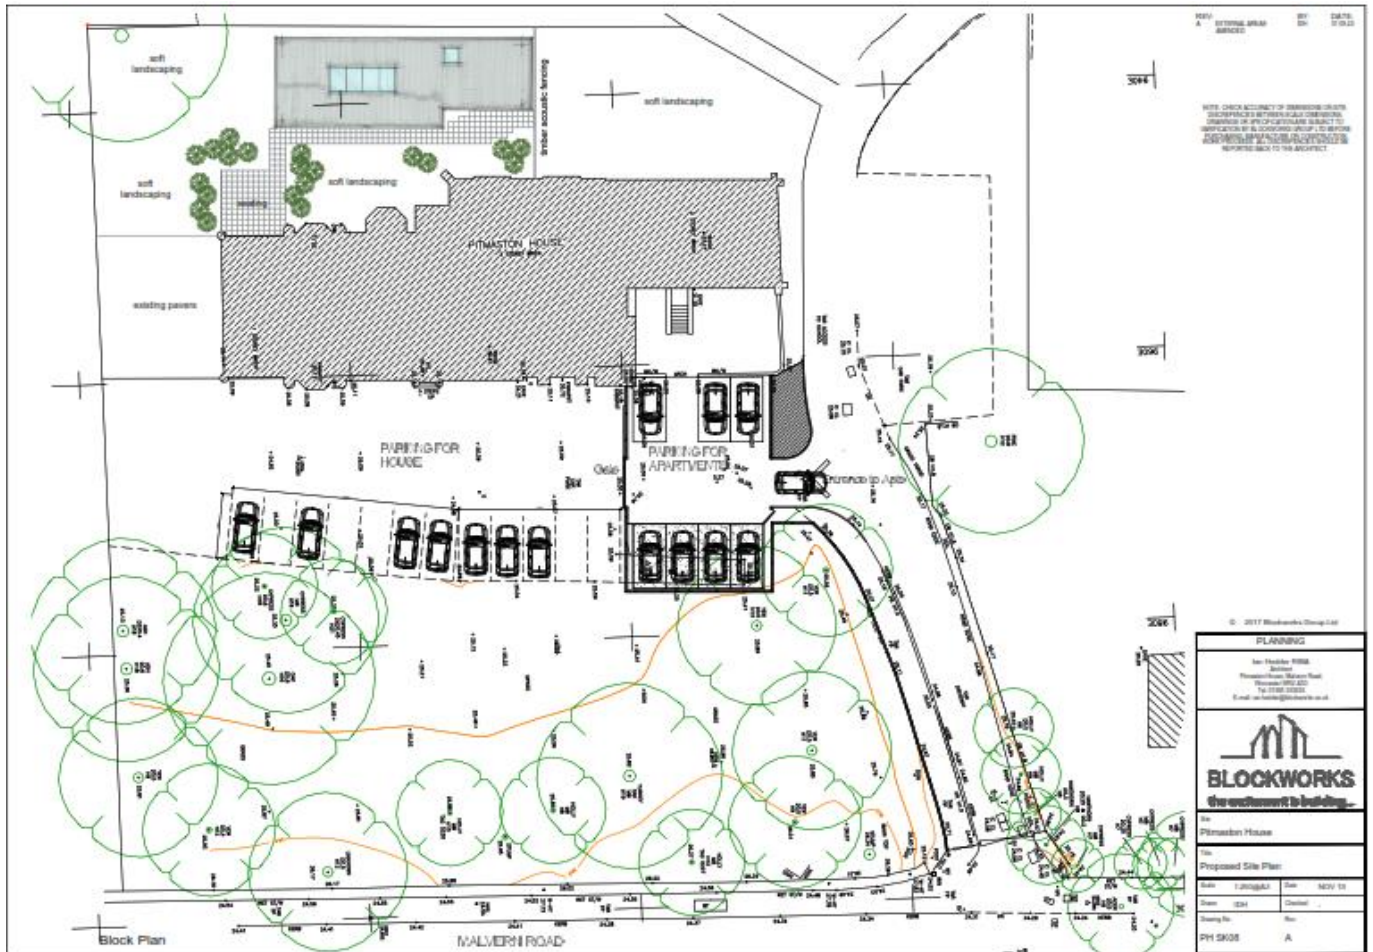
Proposed Site Block Plan (Drawing No: PH SK08 Rev: A)
